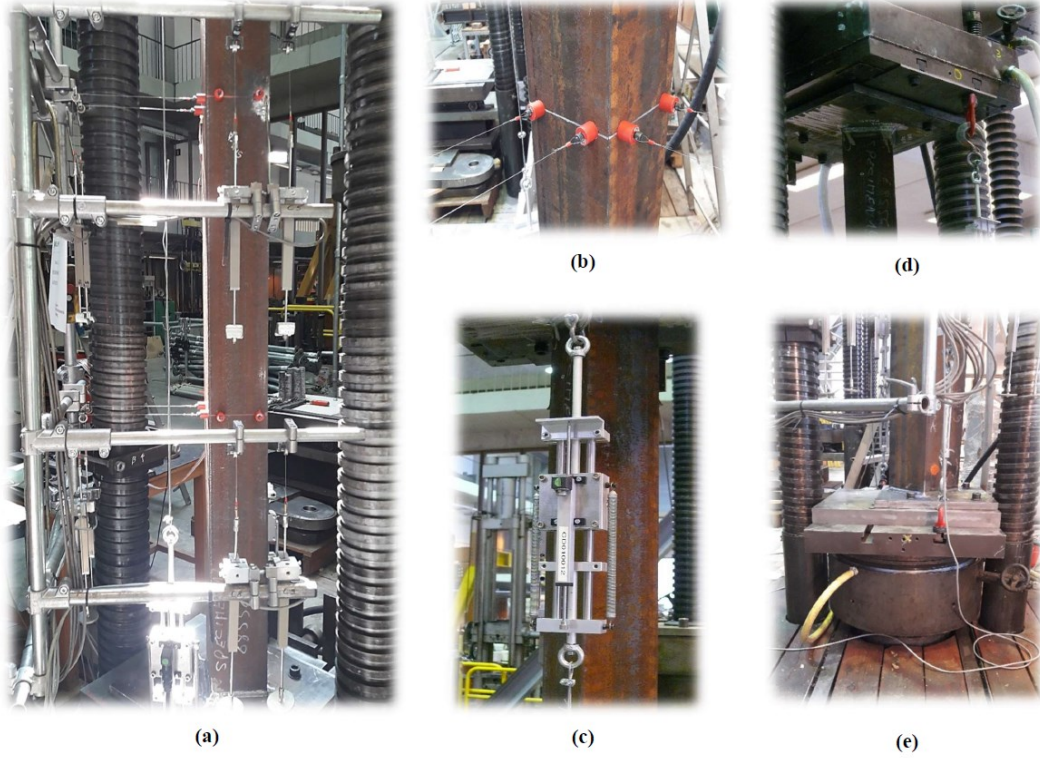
(a) General view of test rig with the measurement devices, (b) connection points of displacement transducers on the cross-section, (c) vertical displacement transducer, (d) detail of the top bearing plate and (e) detail of the bottom bearing plate
